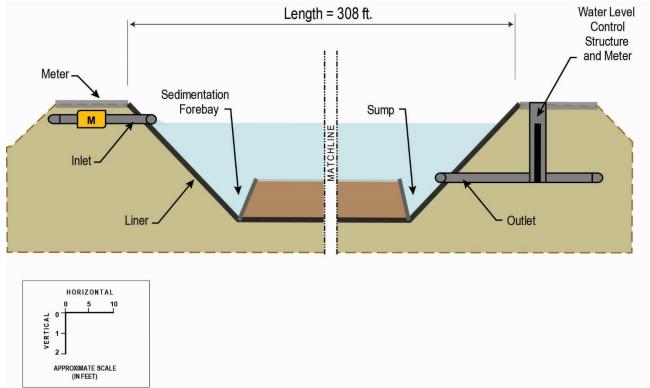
Conceptual Facility Layout: Cross-Section B-B
